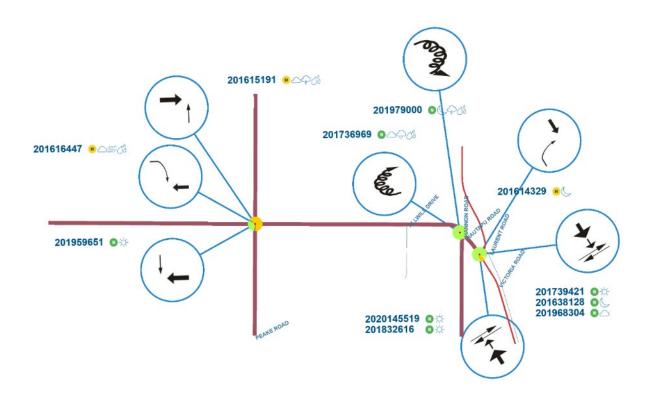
Hautapu Road Collision Diagram (Peak Road to SH1B)
